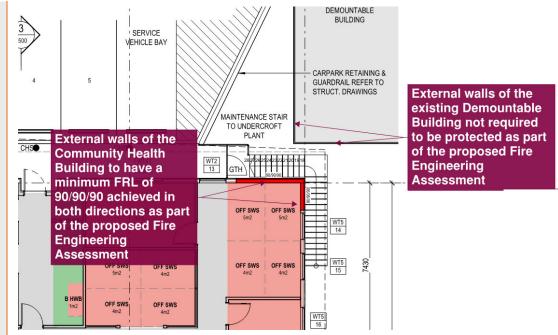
Exposure of external walls of the Community Health Building to the Temporary Demountable Building
